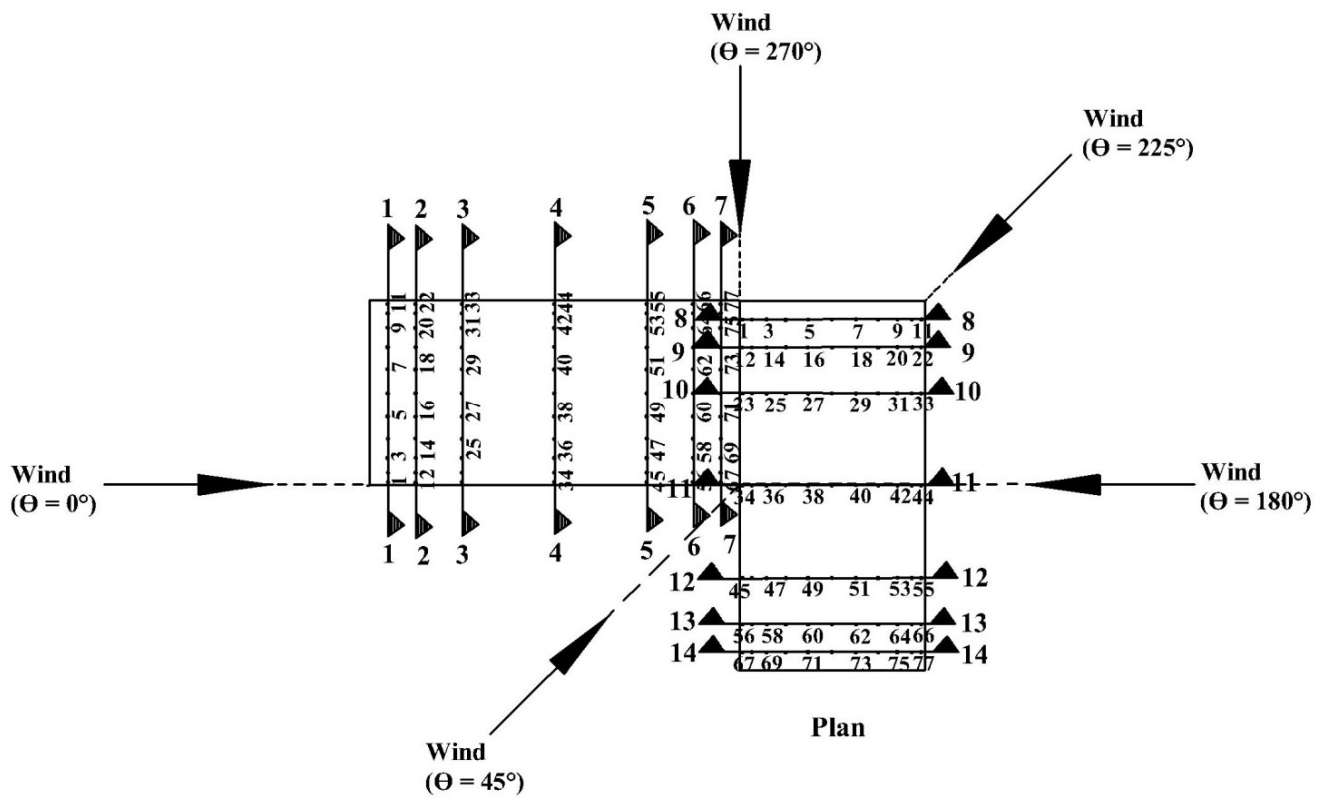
Plan of two buildings with cylindrical roof arranged in L-shape showing various sections
